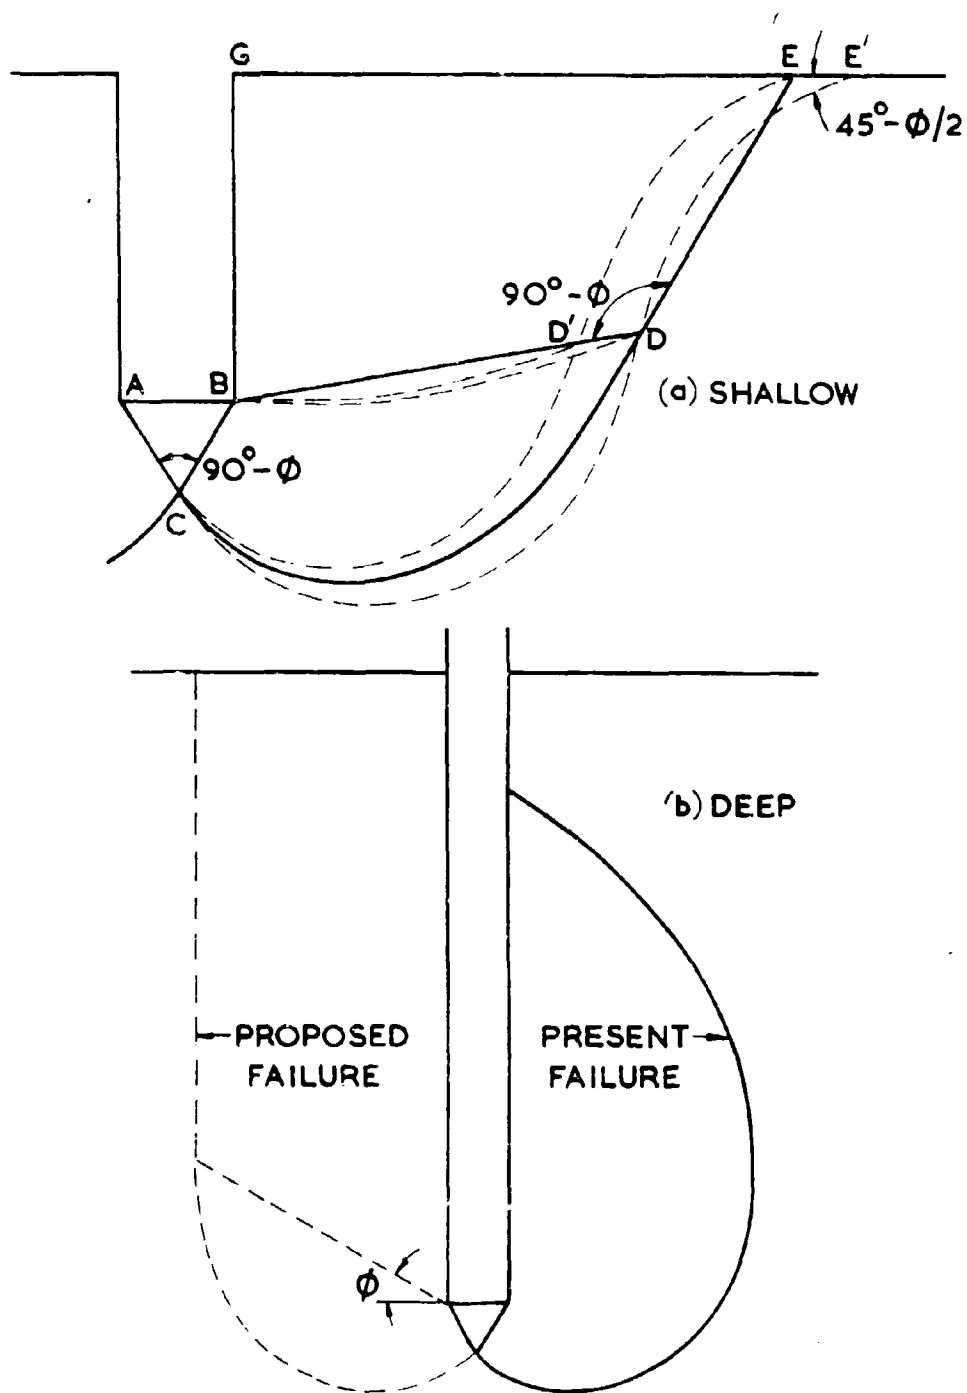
THE POSSIBLE CONFIGURATIONS OF THE FAILURE GEOMETRY FOR A BURIED FOUNDATION
